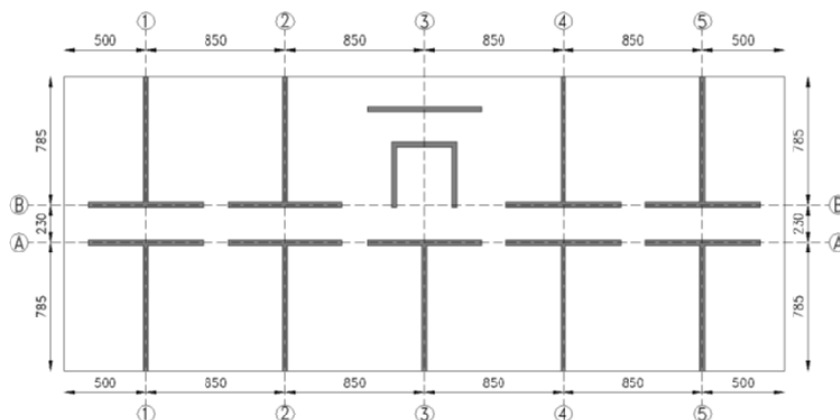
Plan view of the research buildings (dimensions in centimetres).
